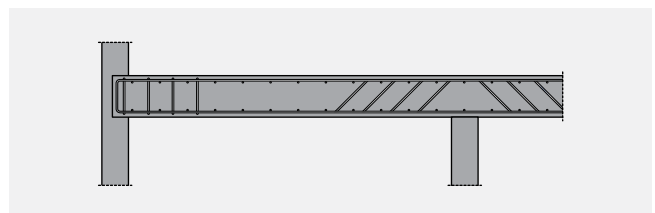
Flat ceiling with stirrups and rebar bent diagonally upwards
